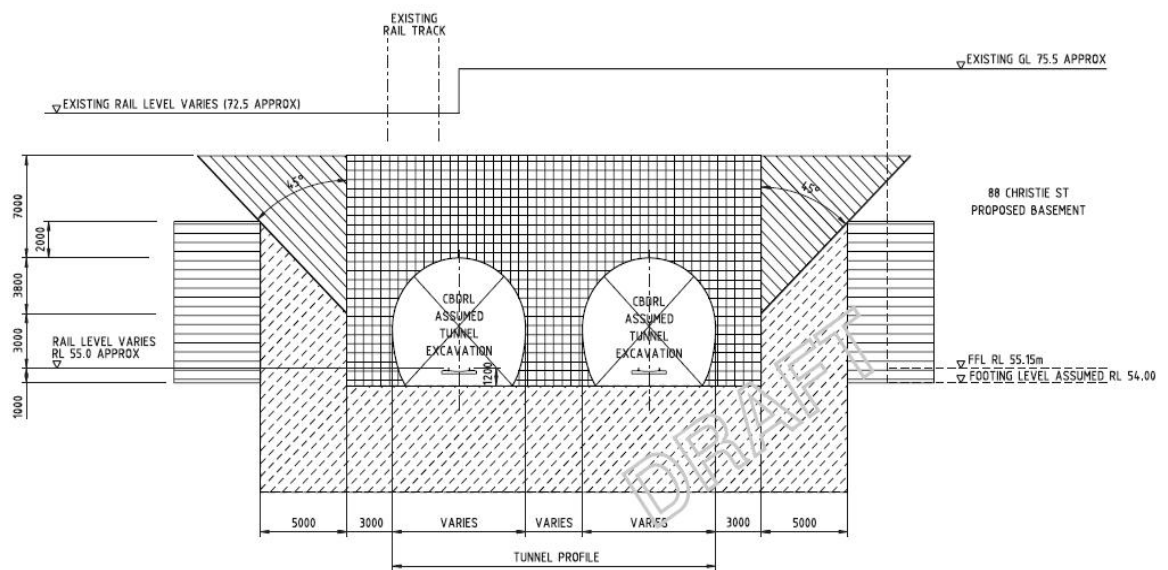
Proposed protection zones for CBDRL running tunnels
